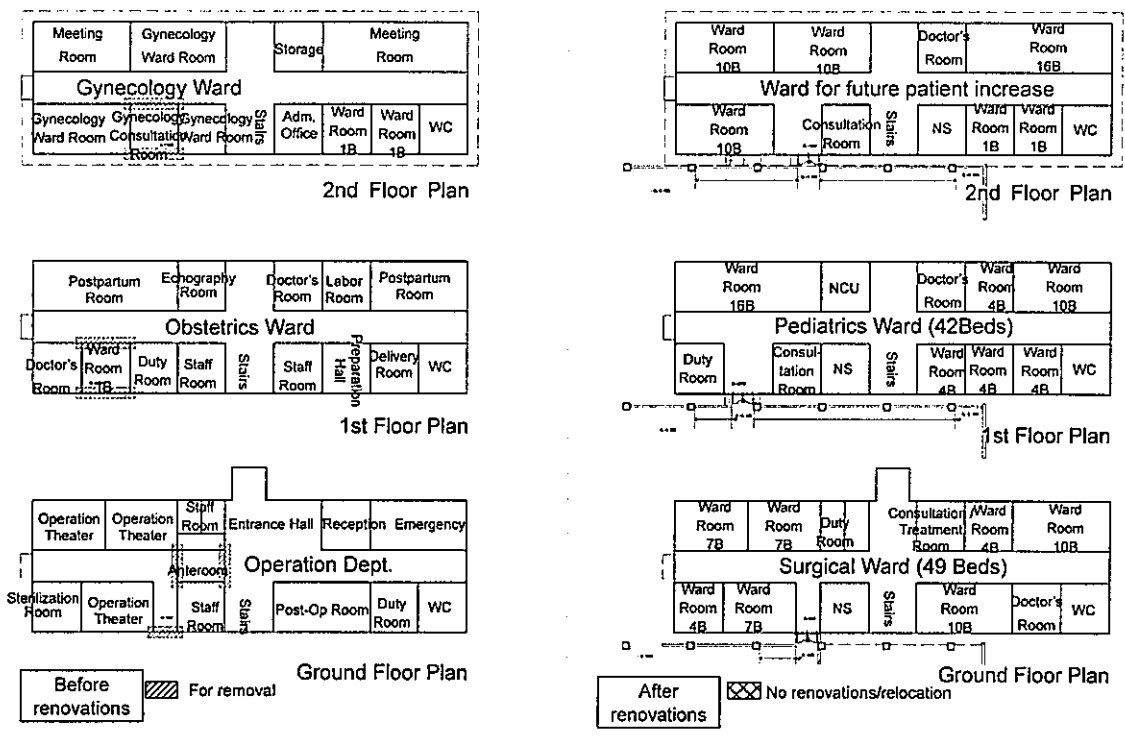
Post-Project Renovation and Relocation Plan for Existing Building C
